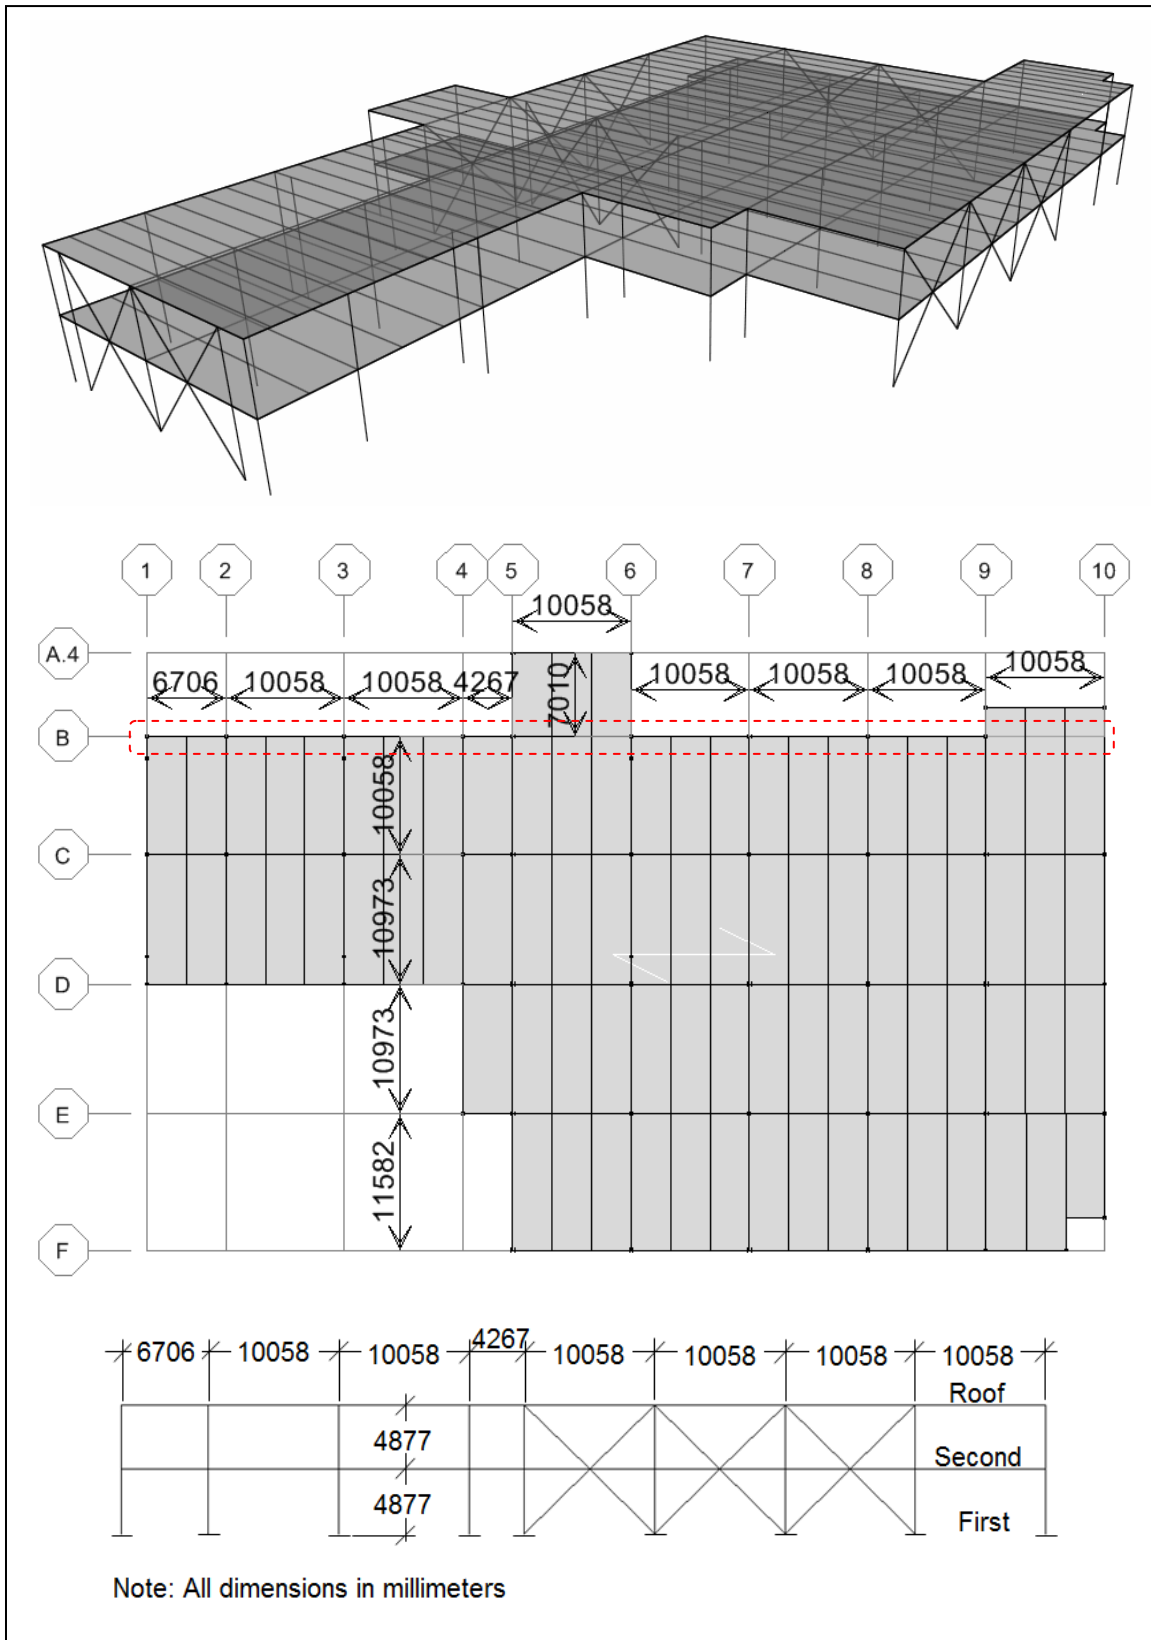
Building BF-2 3D, Plan and Section at Gridline B
